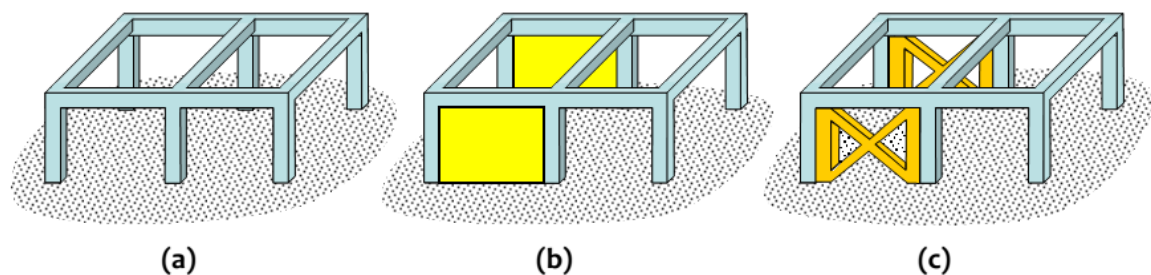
1: Common Structural Systems Employed in Buildings: (a) Moment frames, (b) Moment frames with structural walls, and (c) Braced moment frames
